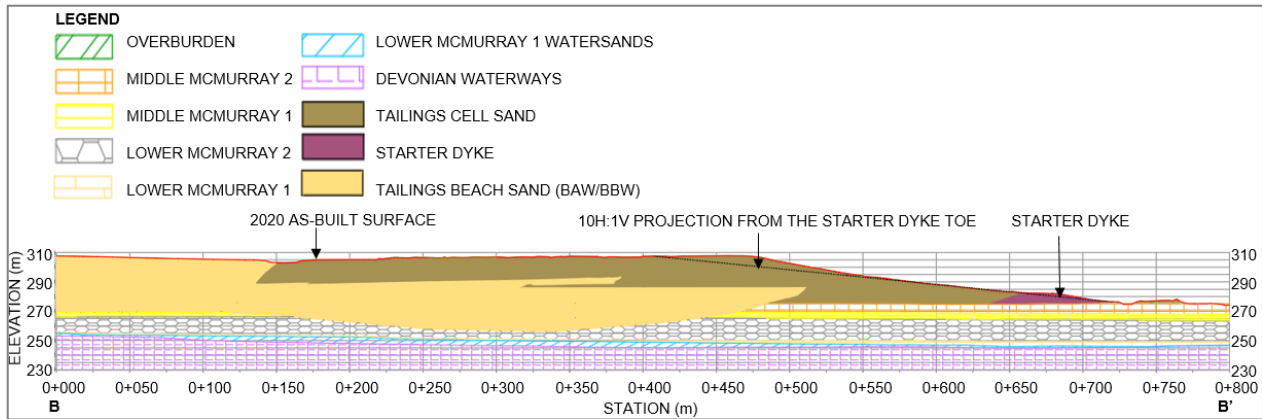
Cross Section View of an Out of Pit Terrestrial Closure Example (B-B')
